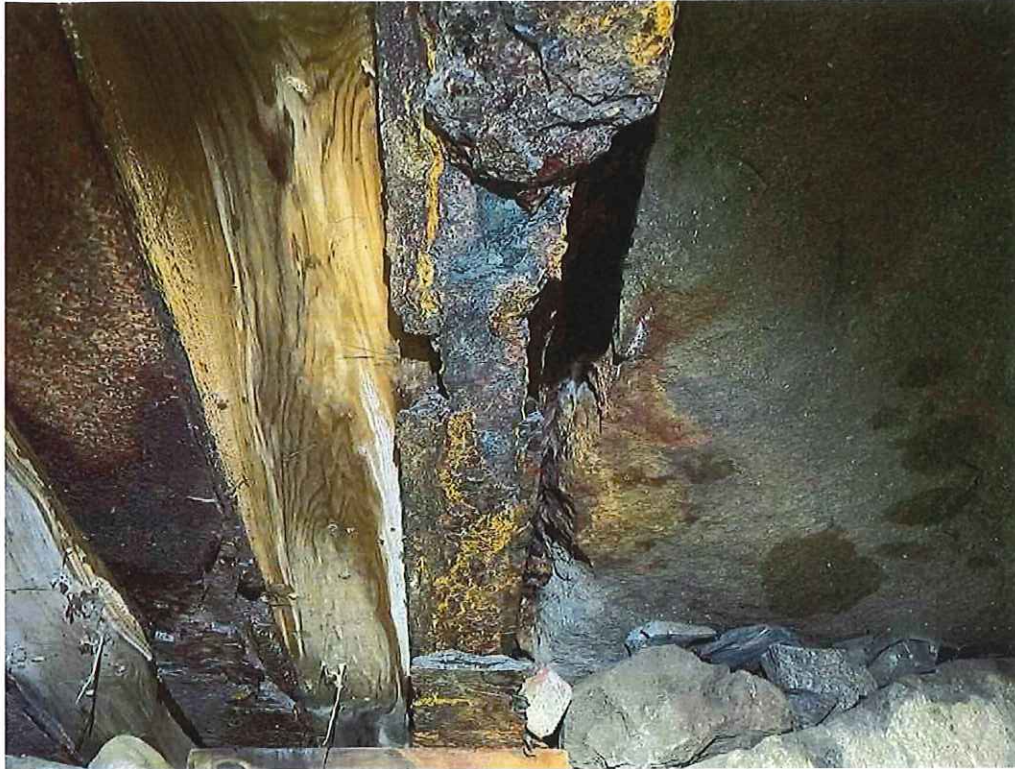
Steel Beam 2 bottom flange at West Abutment: 100% section loss x 1" wide at the south toe with 3/16" thickness remaining.
